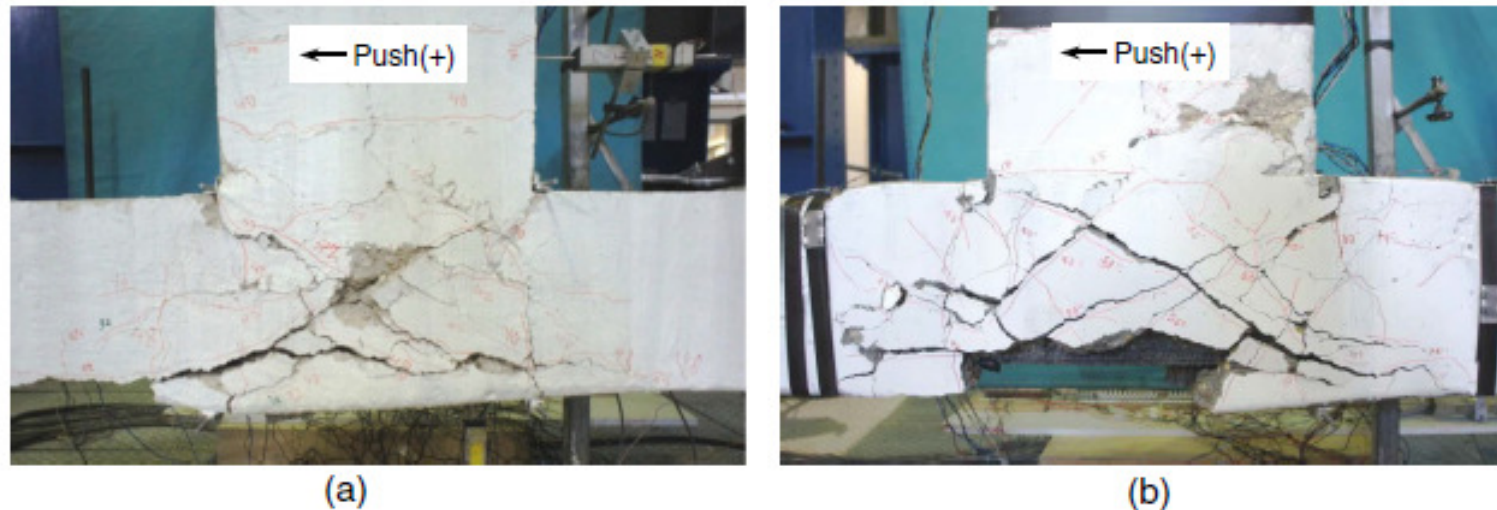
Typical failure of (a) bare joints (JB2); (b) rehabilitated joint JB2R
